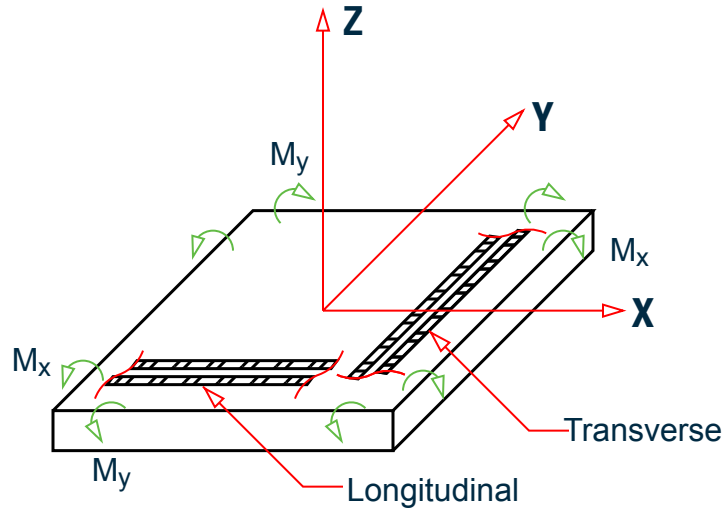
Element moments: Longitudinal (L) and Transverse (T)
